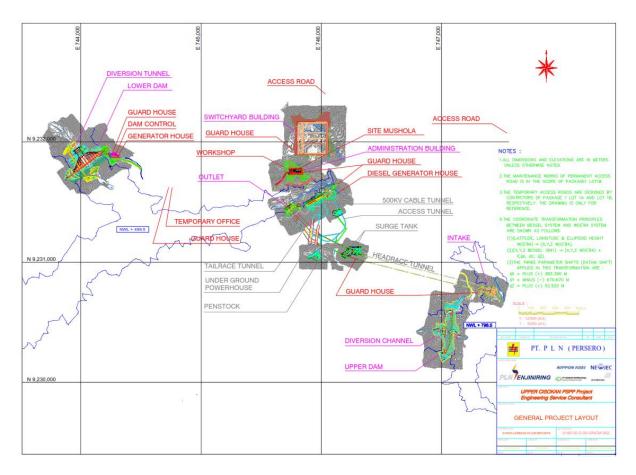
Construction site on the Upper Cisokan Hydroelectric Power Plant
